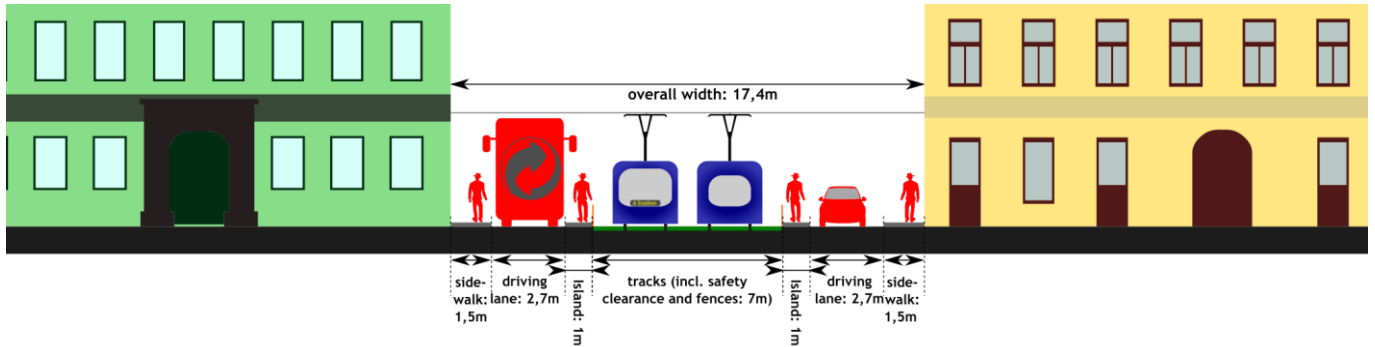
Minimum required street cross-section for a double-track LCRT line with driving lane, sidewalk and a waiting area (safety island) between driving lane and track
